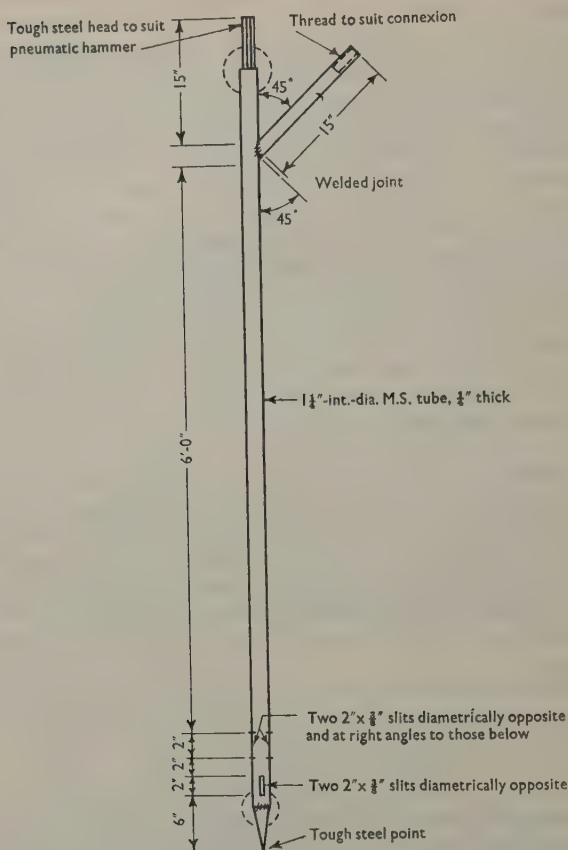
ORIGINAL POINT USED FOR SHALLOW GROUTING
